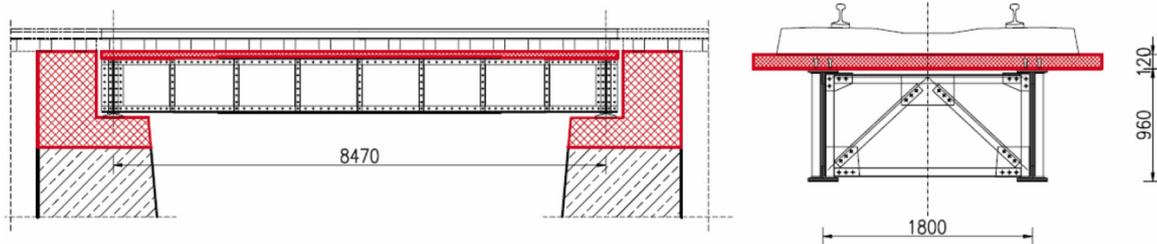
Concept of strengthening of the old steel bridge with the UHPFRC deck.
